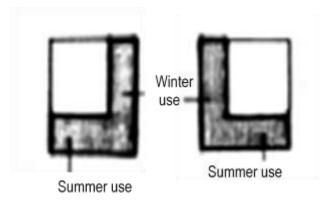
L types plan in Diyarbakir traditional houses (Bekleyen & Dalkilic, 2011)
